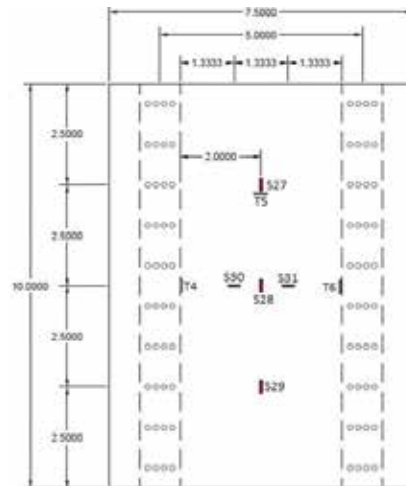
Strain gage (S) and thermocouple (T) location in overhead view
